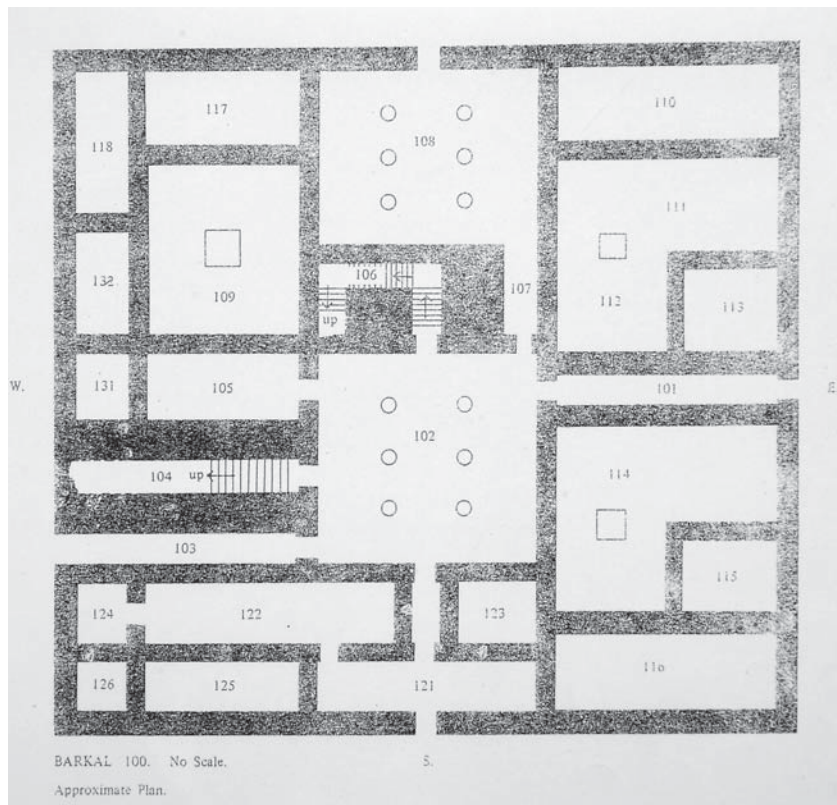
Plan of B 100 (Courtesy T. Kendall)
